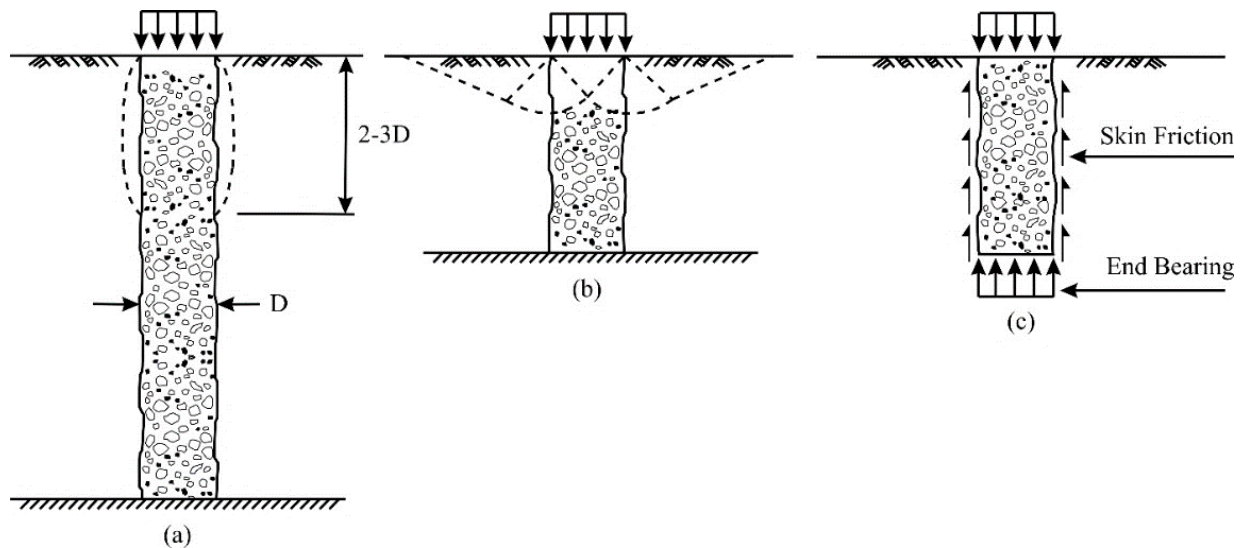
Failure mechanism of single stone column in homogenous soft soil [7]; (a) Long stone column with or without floating support: bulging failure, (b) Short column with rigid base: shear failure, (c) Short floating column: punching failure
